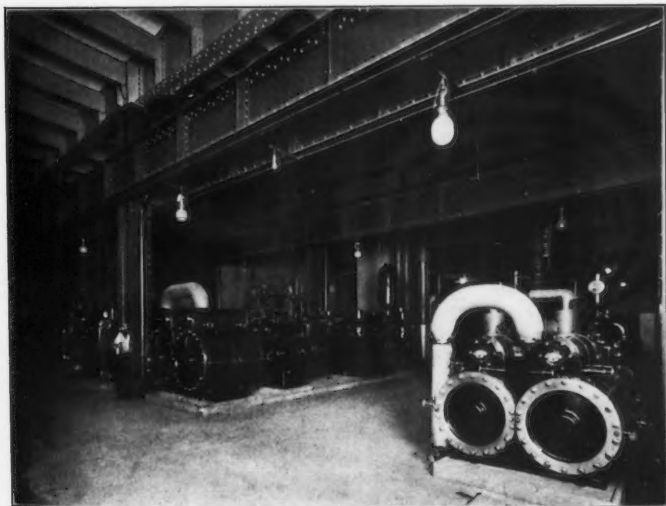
HYDRAULIC ELEVATOR PUMPS.
